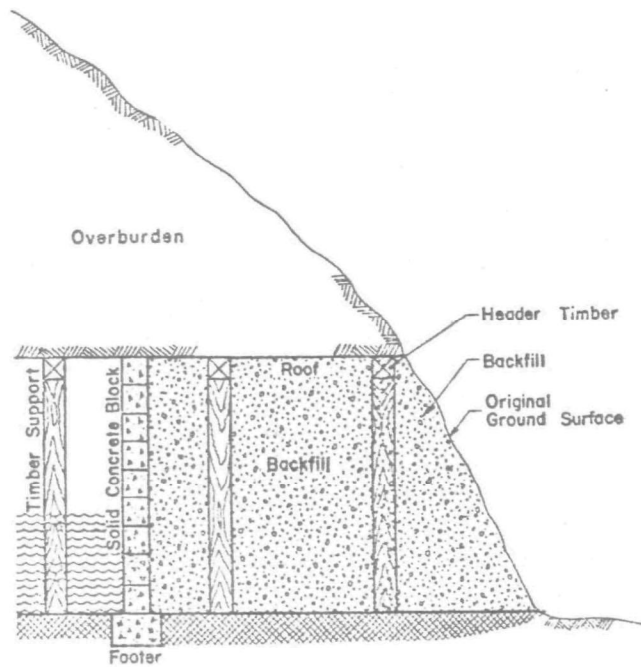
Cross section of a typical single bulkhead seal for drift mouth abandonment.
